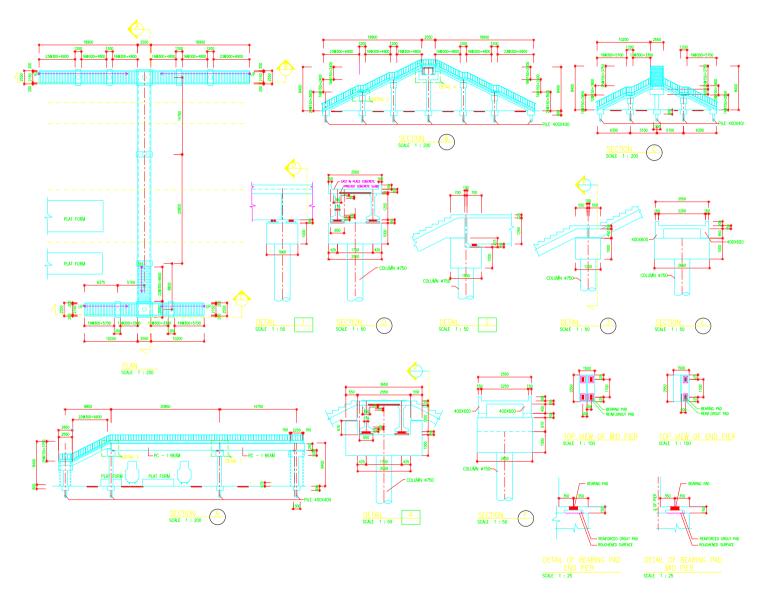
Bekasi Timur Footbridge General Arrangement
